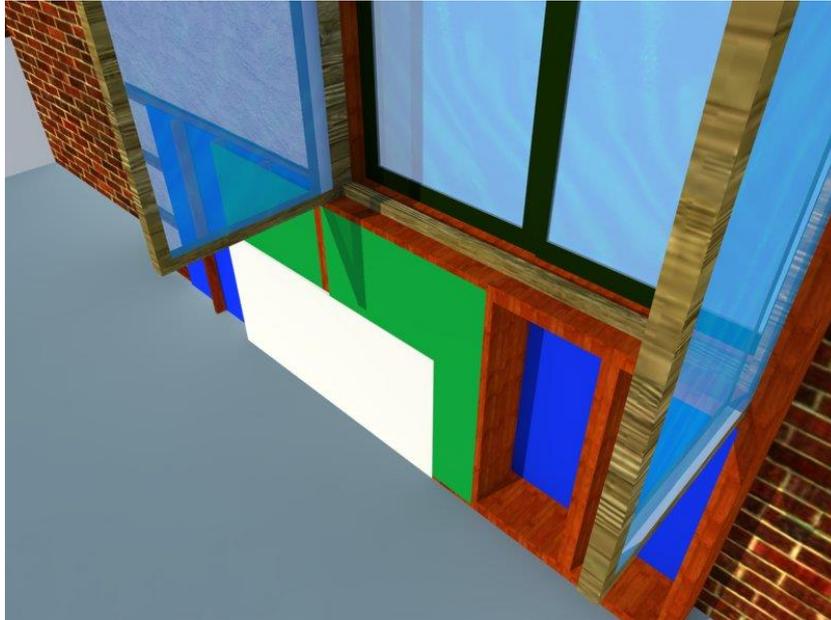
1 Sketchup detail of the new wooden structure for the installation of new windows
